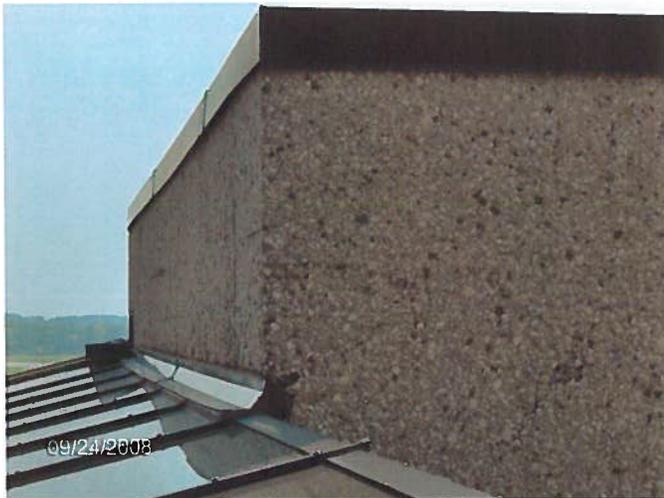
East Elevator Shaft Flashing– South Skywalk
